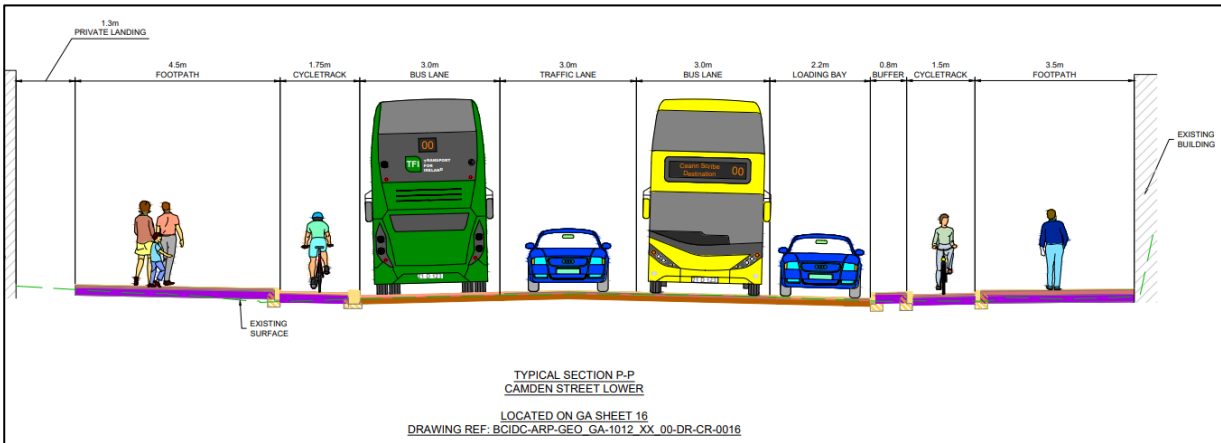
Typical Cross-Section adjacent to 71 Camden Street Lower
